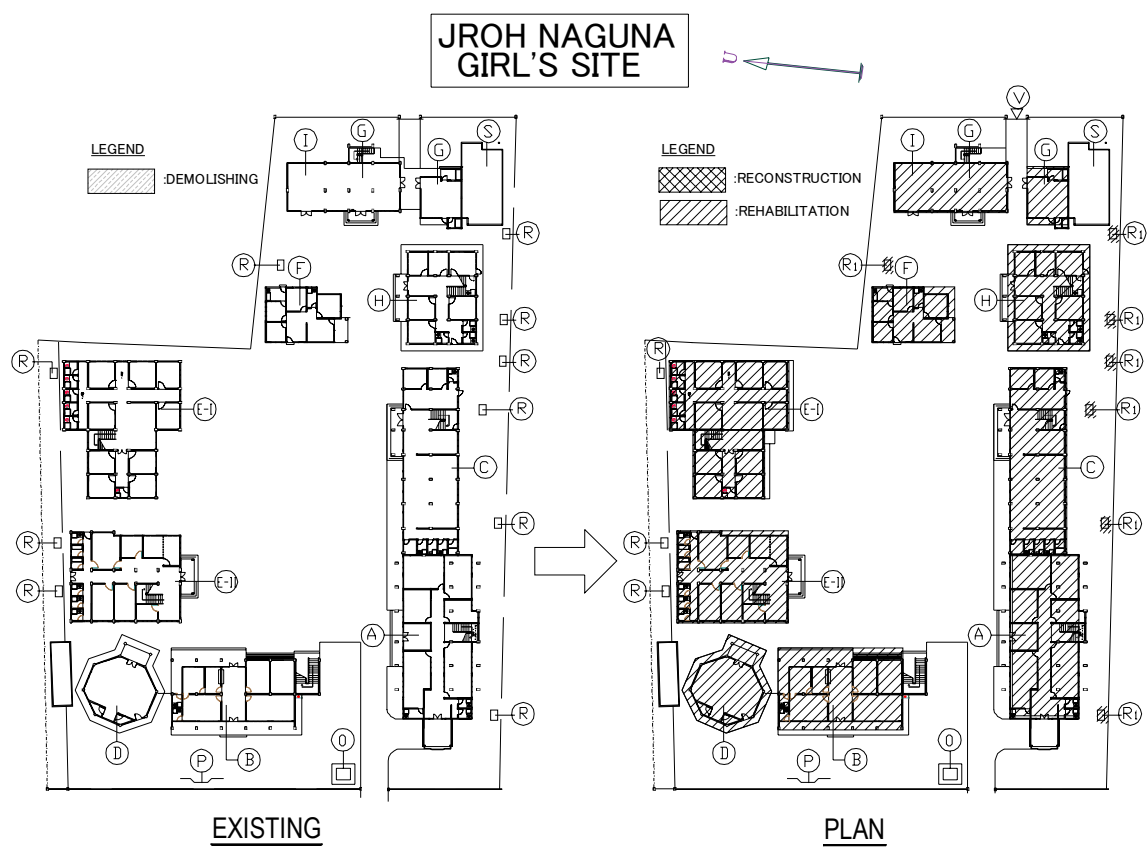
Site Plan and Rehabilitation Plan for Jroh Naguna Orphanage (Girl's Site)
